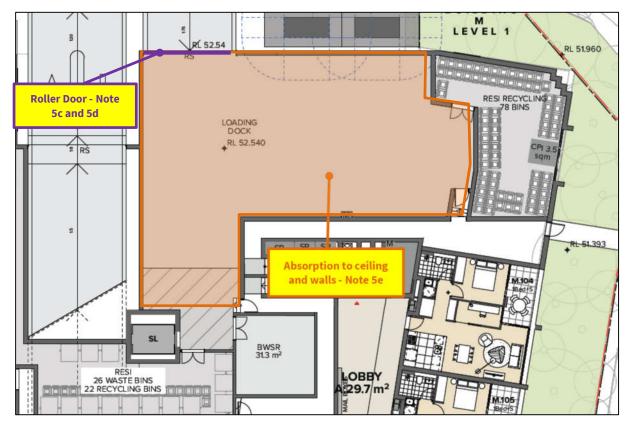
Loading dock was on Level 1 of Building 2C (image source – architectural drawings)
